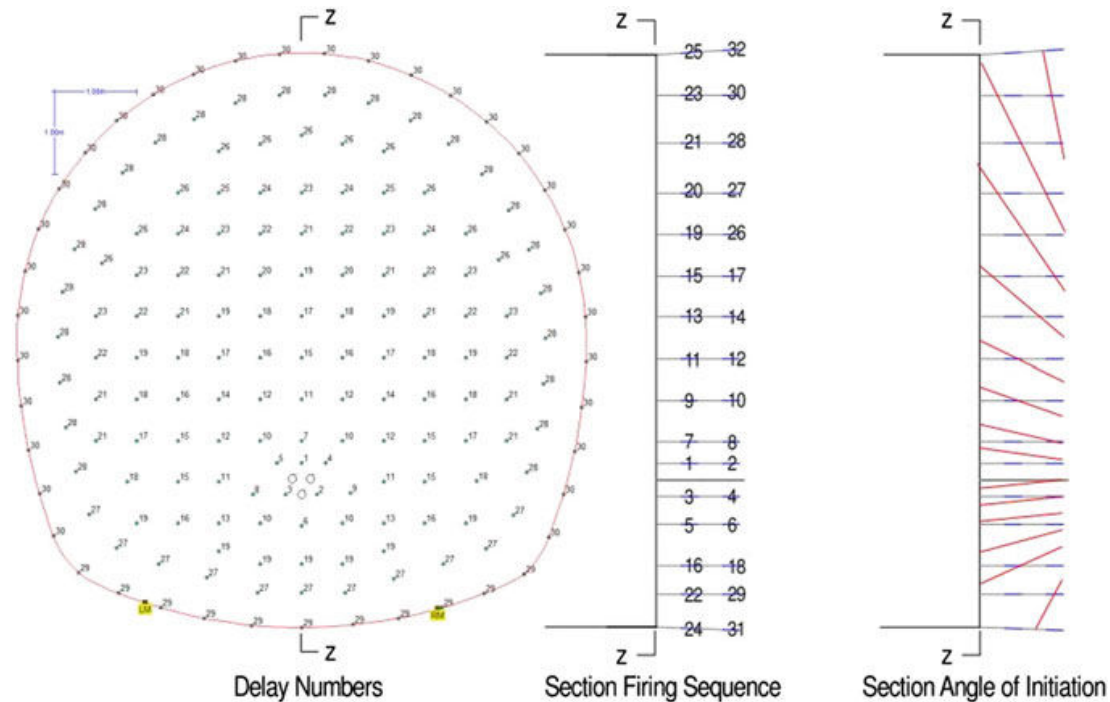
Tunnel blasting design using double charging technique and electronic detonators (reproduced from Ref. [9], courtesy of ISEE)
